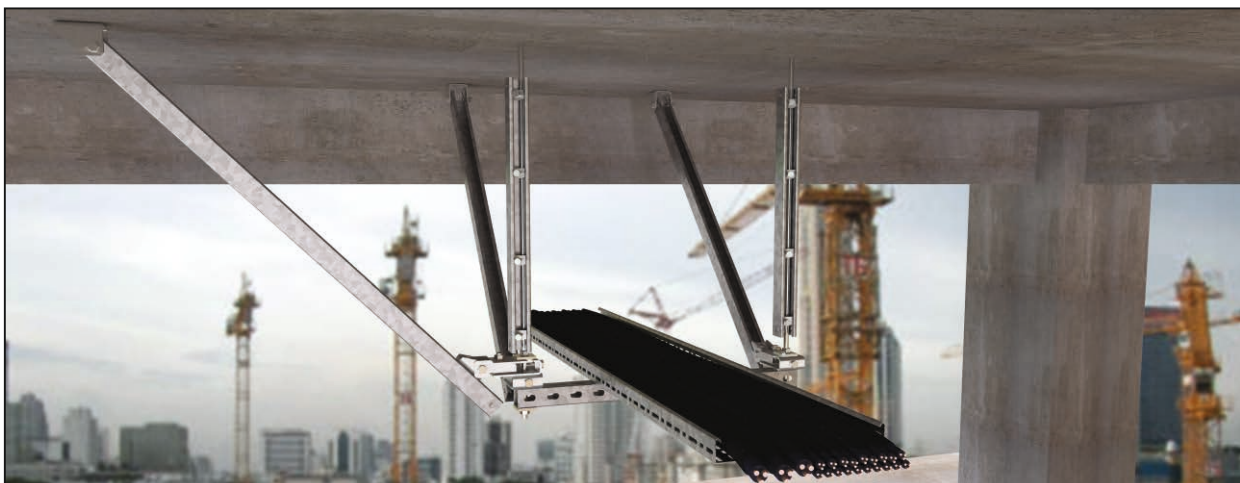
, 3.8, 3.9, 3.10 Rigid Seismic Bracing (Steel Strut) Applications on Cable Trays and Conduits
